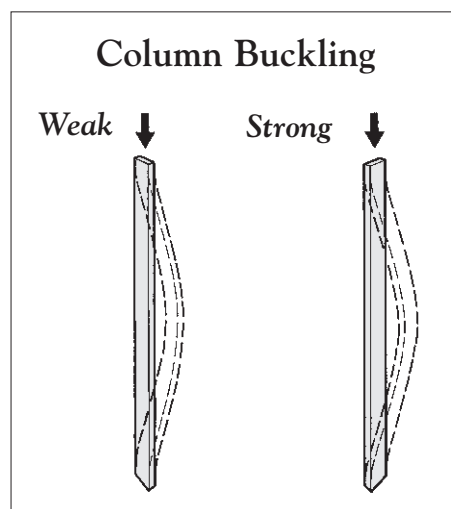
A stud or post must resist buckling in two directions — sideways (the lumber's weaker direction) and perpendicular to the wall plane (the stronger direction). Structural sheathing or horizontal blocking will prevent sideways buckling, so often the "stronger" direction is the problem.
